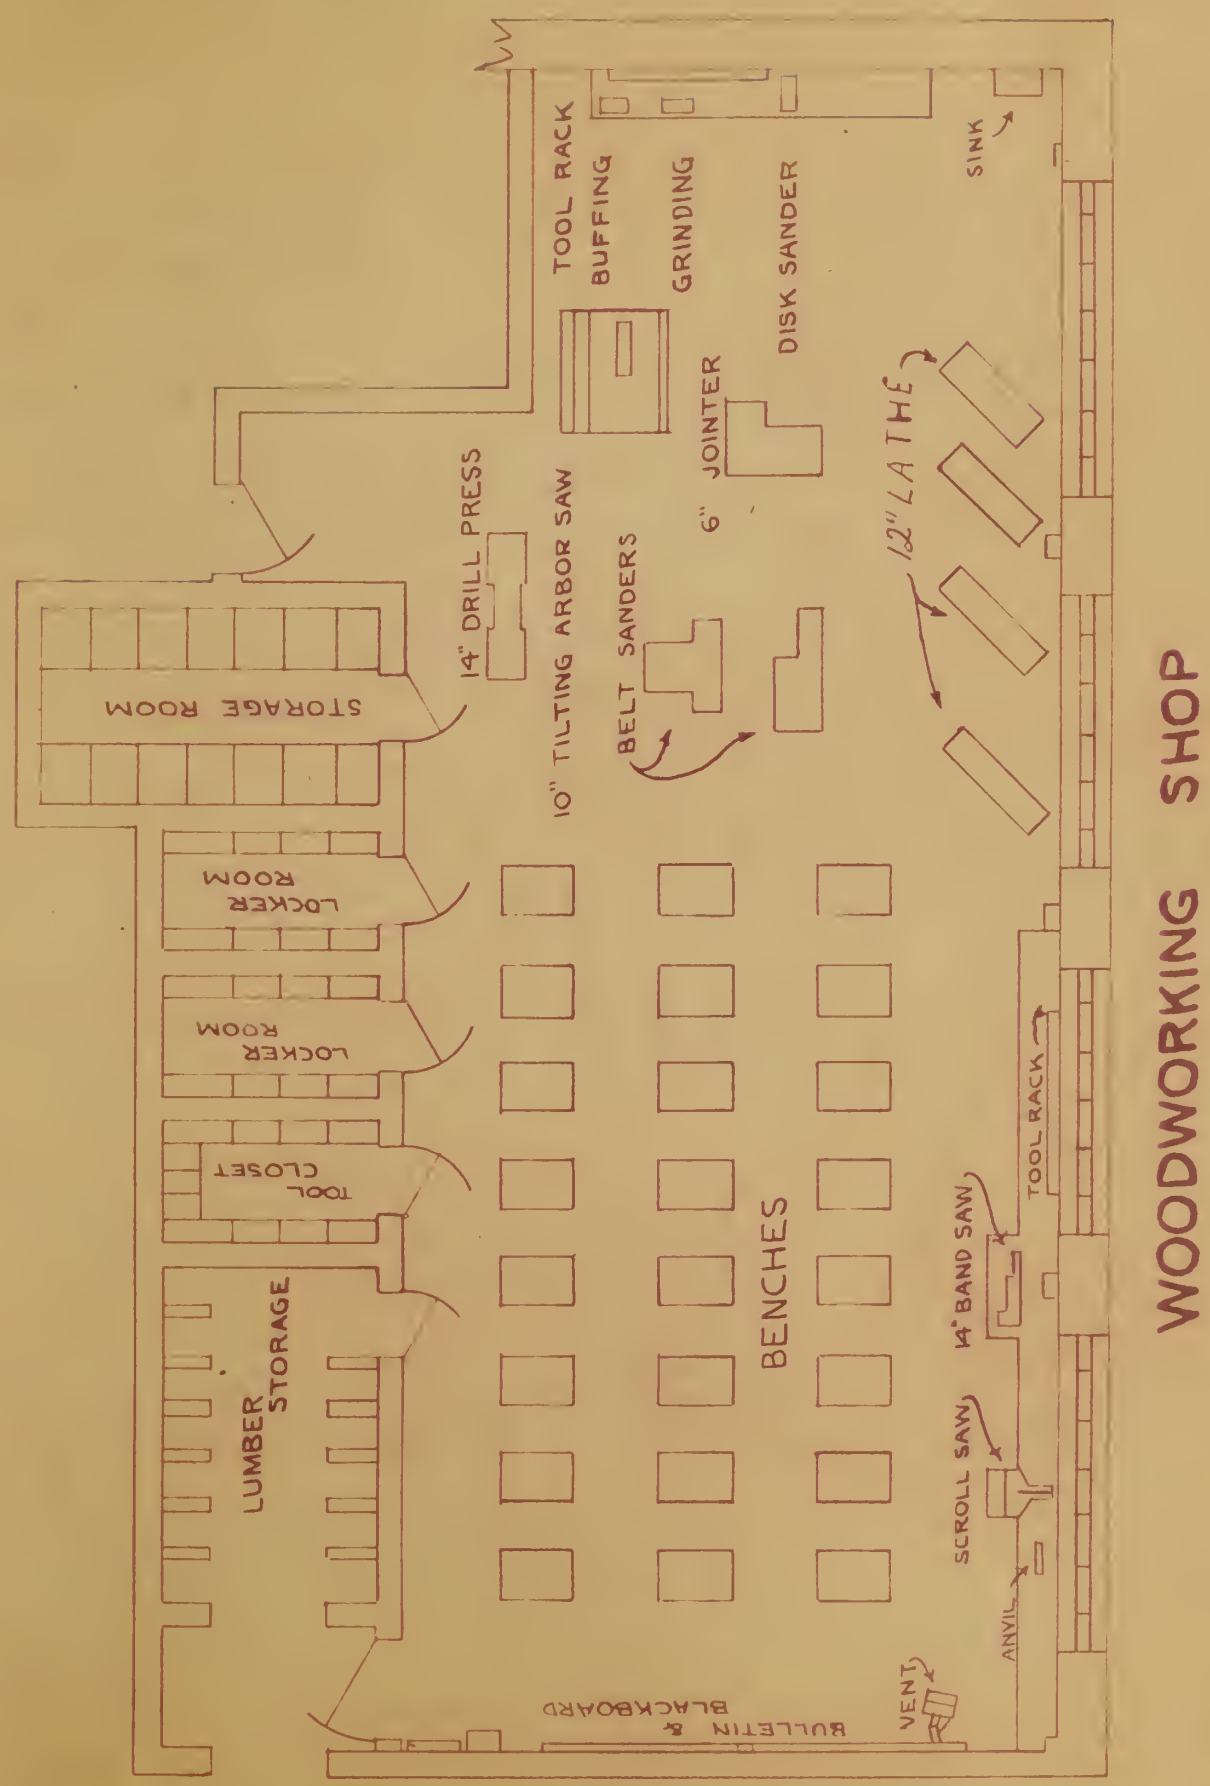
Proposed Floor Plans for Woodworking Shop.
